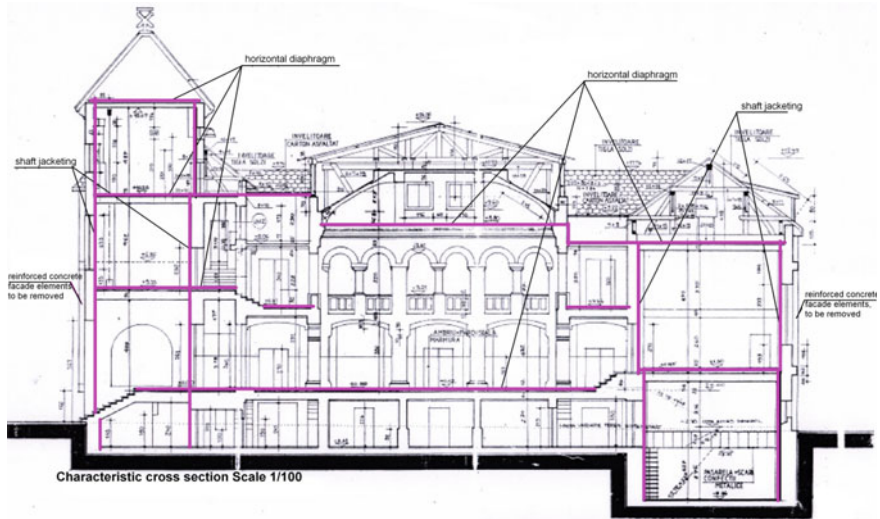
Elevation of the former Focșani courthouse, highlighting as the newer structural interventions proposed in the strengthening project
